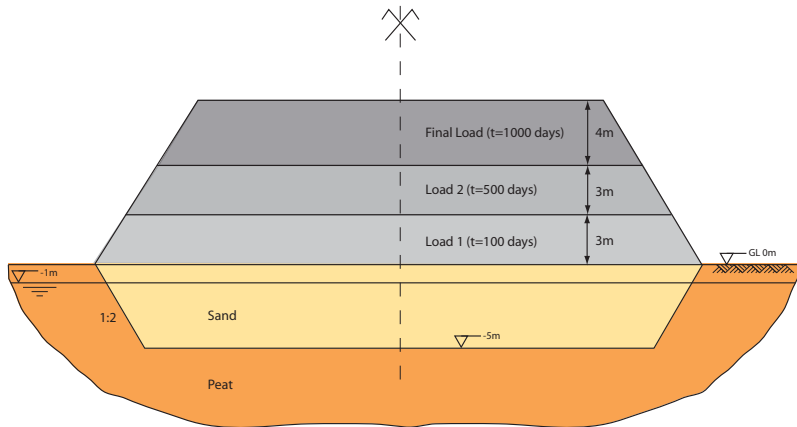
Ground improvement and embankment construction in three stages (Tutorial 4)
